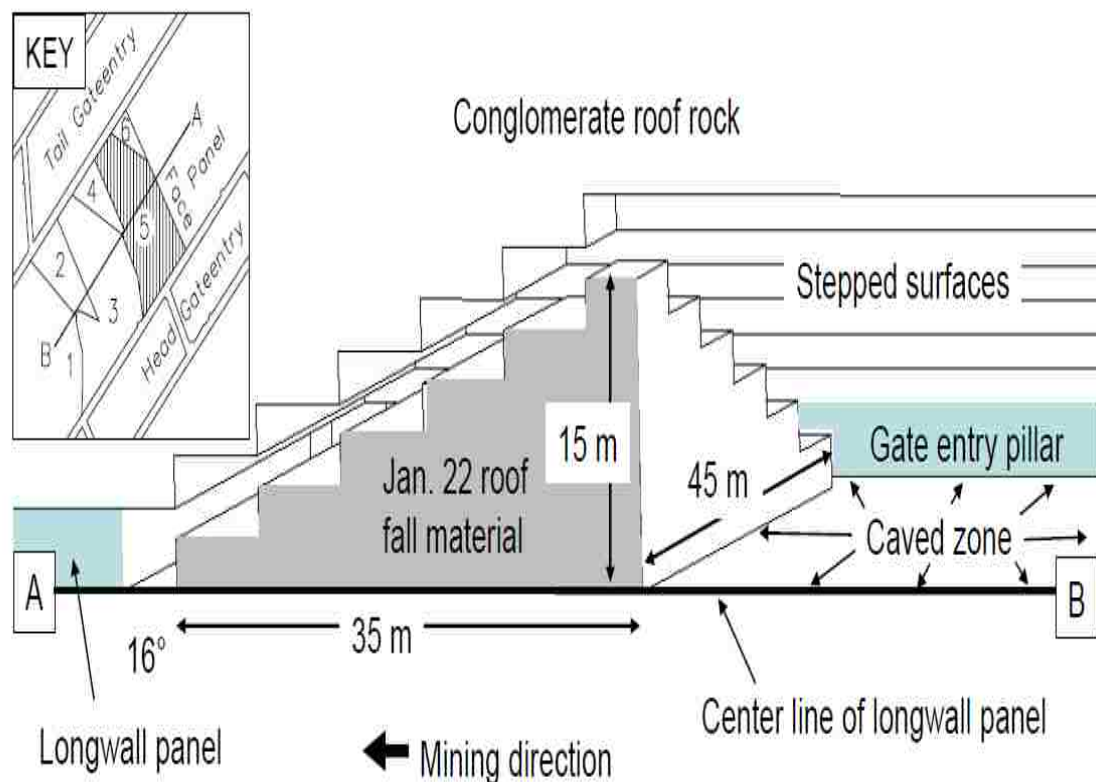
Generalized sketch of the Jan. 22 roof fall (Fall No. 5), longwall panel No.1, Moonee Mine [85]
